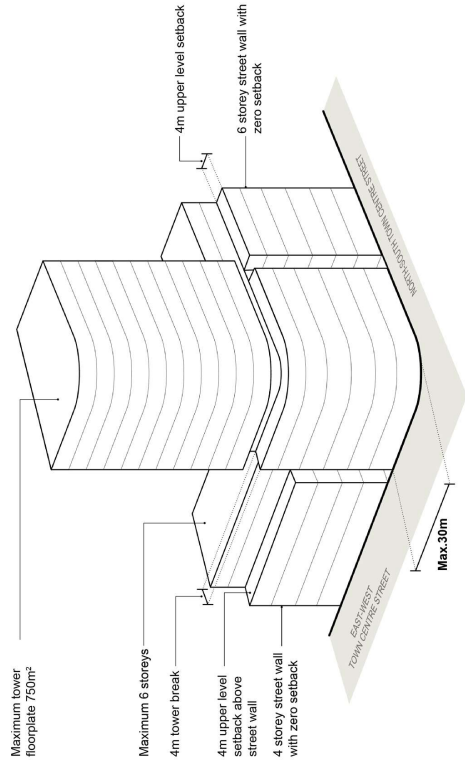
Town Centre Setbacks - 4 and 6 storey street wall and corner towers
